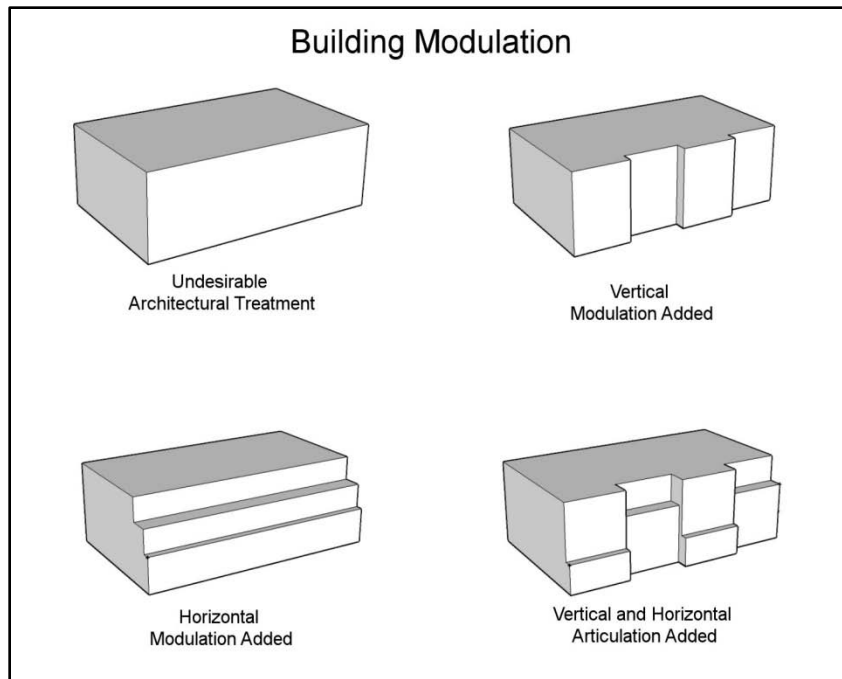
B – Examples of vertical and horizontal building modulation by projecting forward or recessing back portions or elements of the facade.
